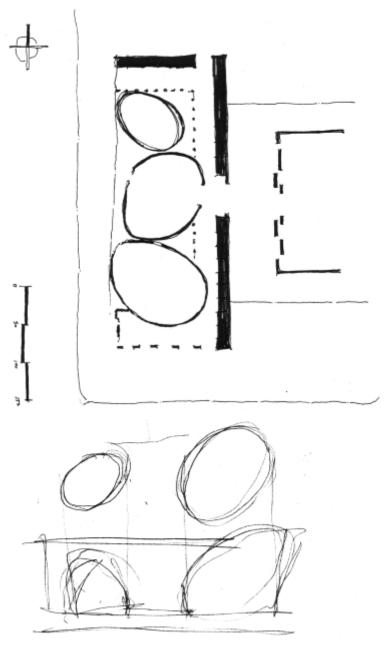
Plan and elevation showing ideas about use of ova forms.
